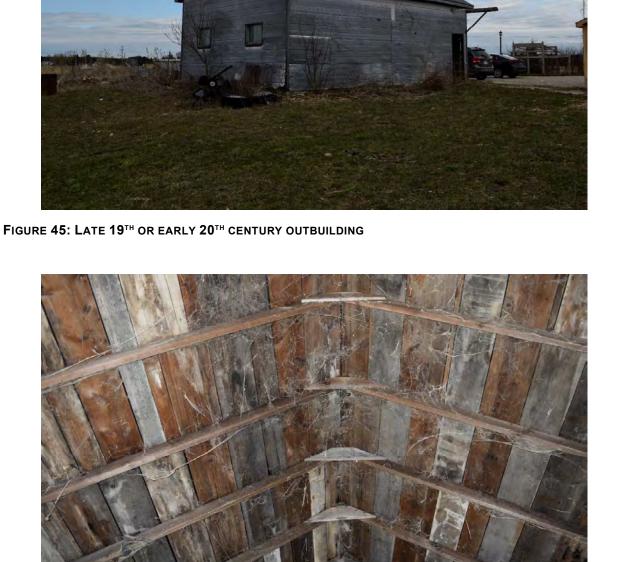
ROOF CONSTRUCTION OF LATE 19TH OR EARLY 20TH CENTURY OUTBUILDING
